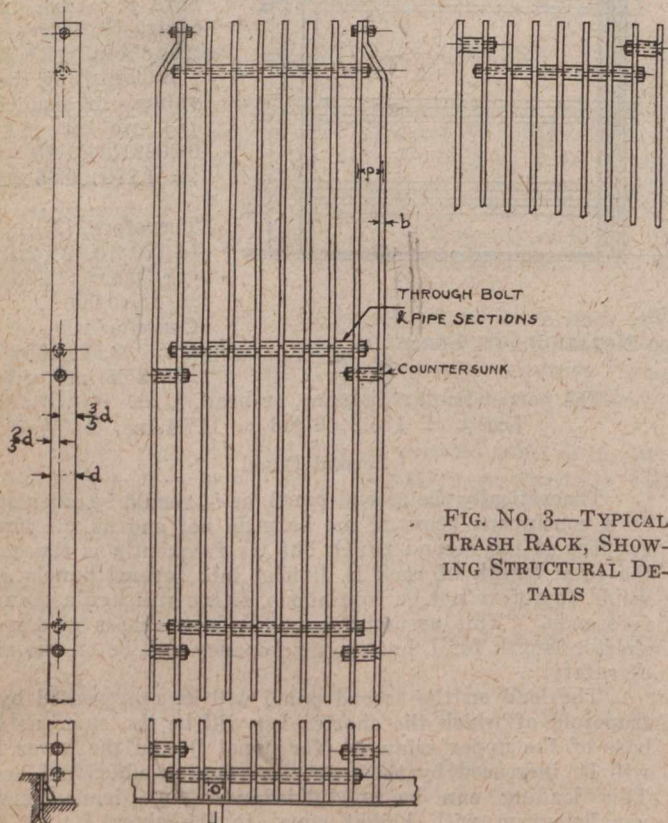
TYPICAL TRASH RACK, SHOWING STRUCTURAL DETAILS
